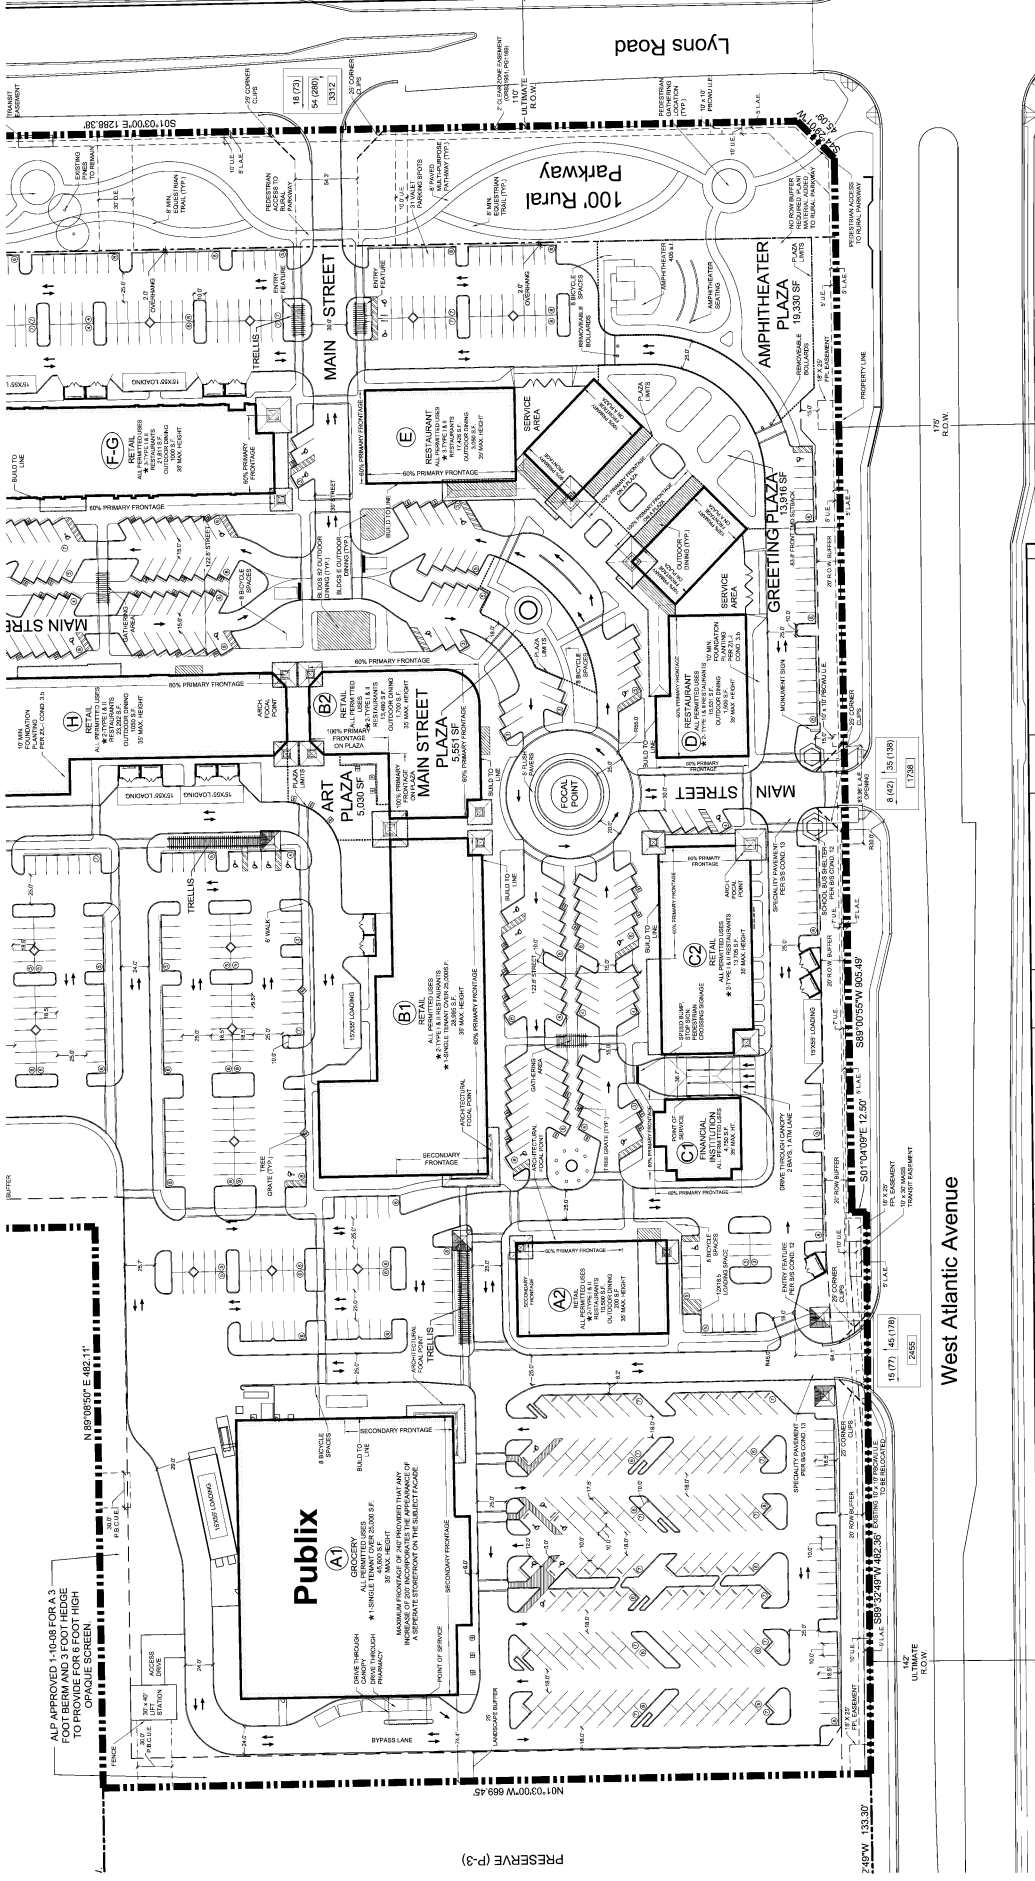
Preliminary Site Plan dated April 18, 2011, page 3
